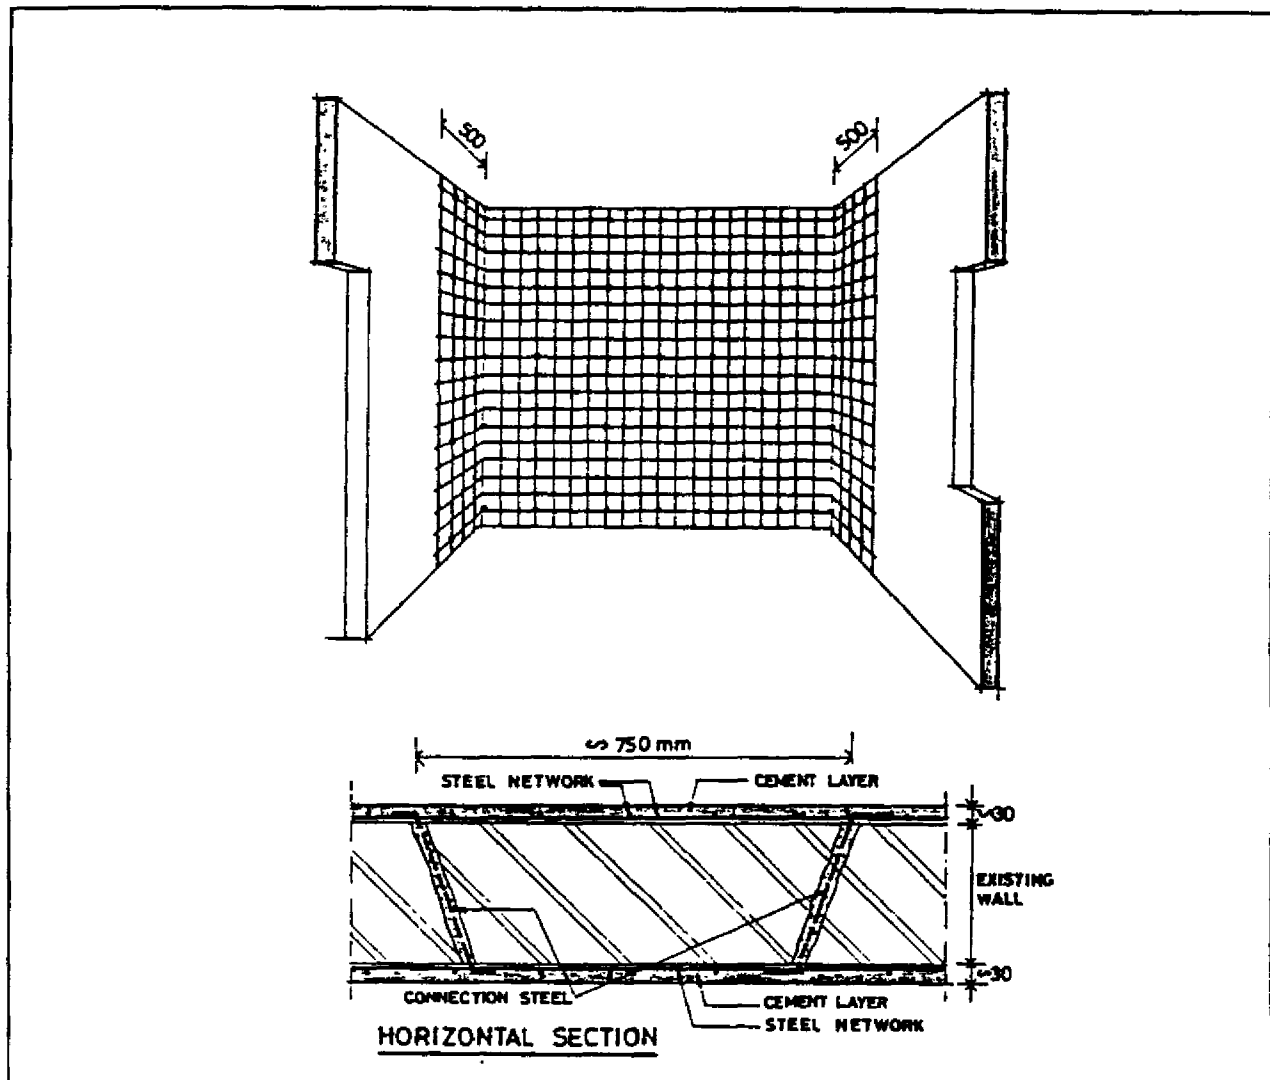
Vertical Reinforced Concrete Covering Plates (Jackets). [1]
